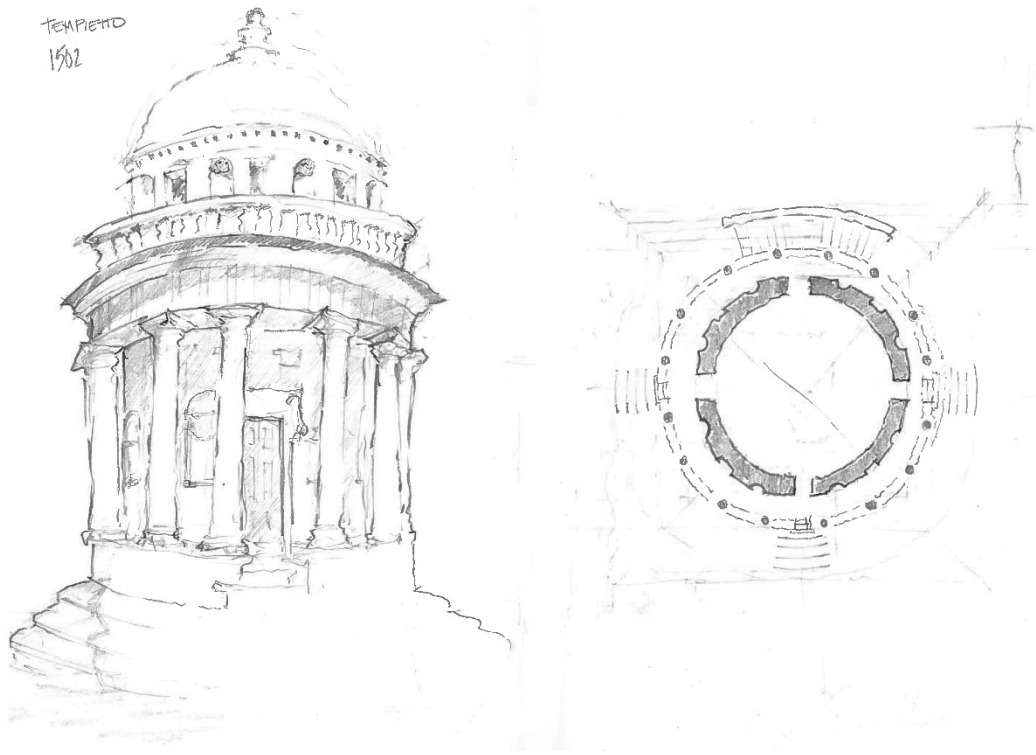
, Tempietto, Perspective and Plan (Source: Author)
